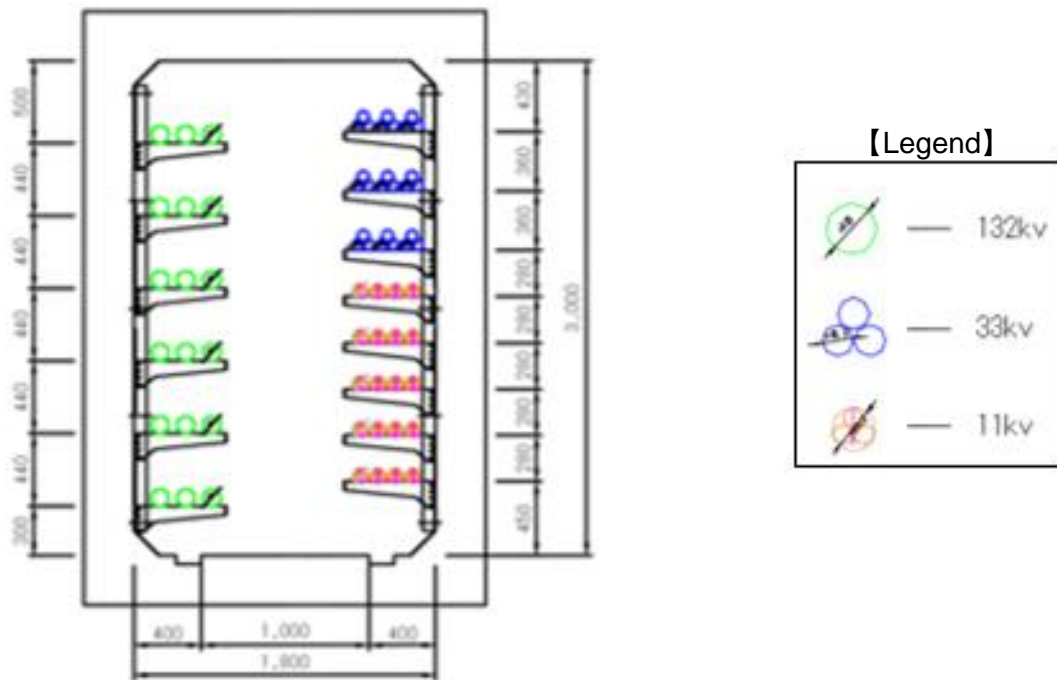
Location of Underground Tunnel for Gulshan UGSS
